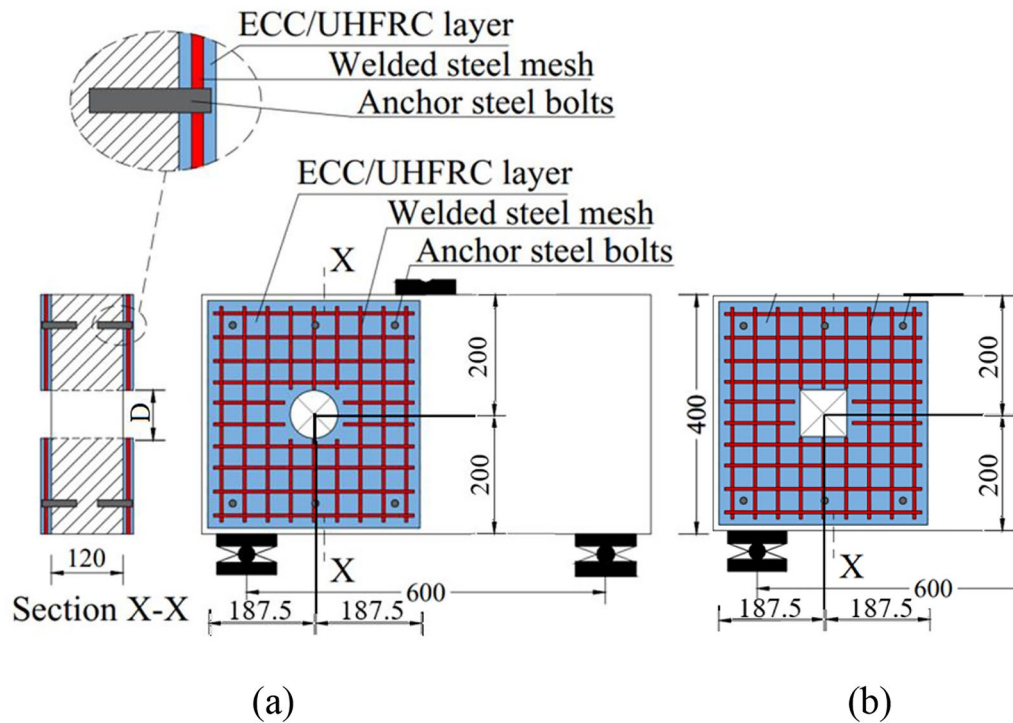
Dimensions and reinforcement of tested deep beams. (Units: mm)
